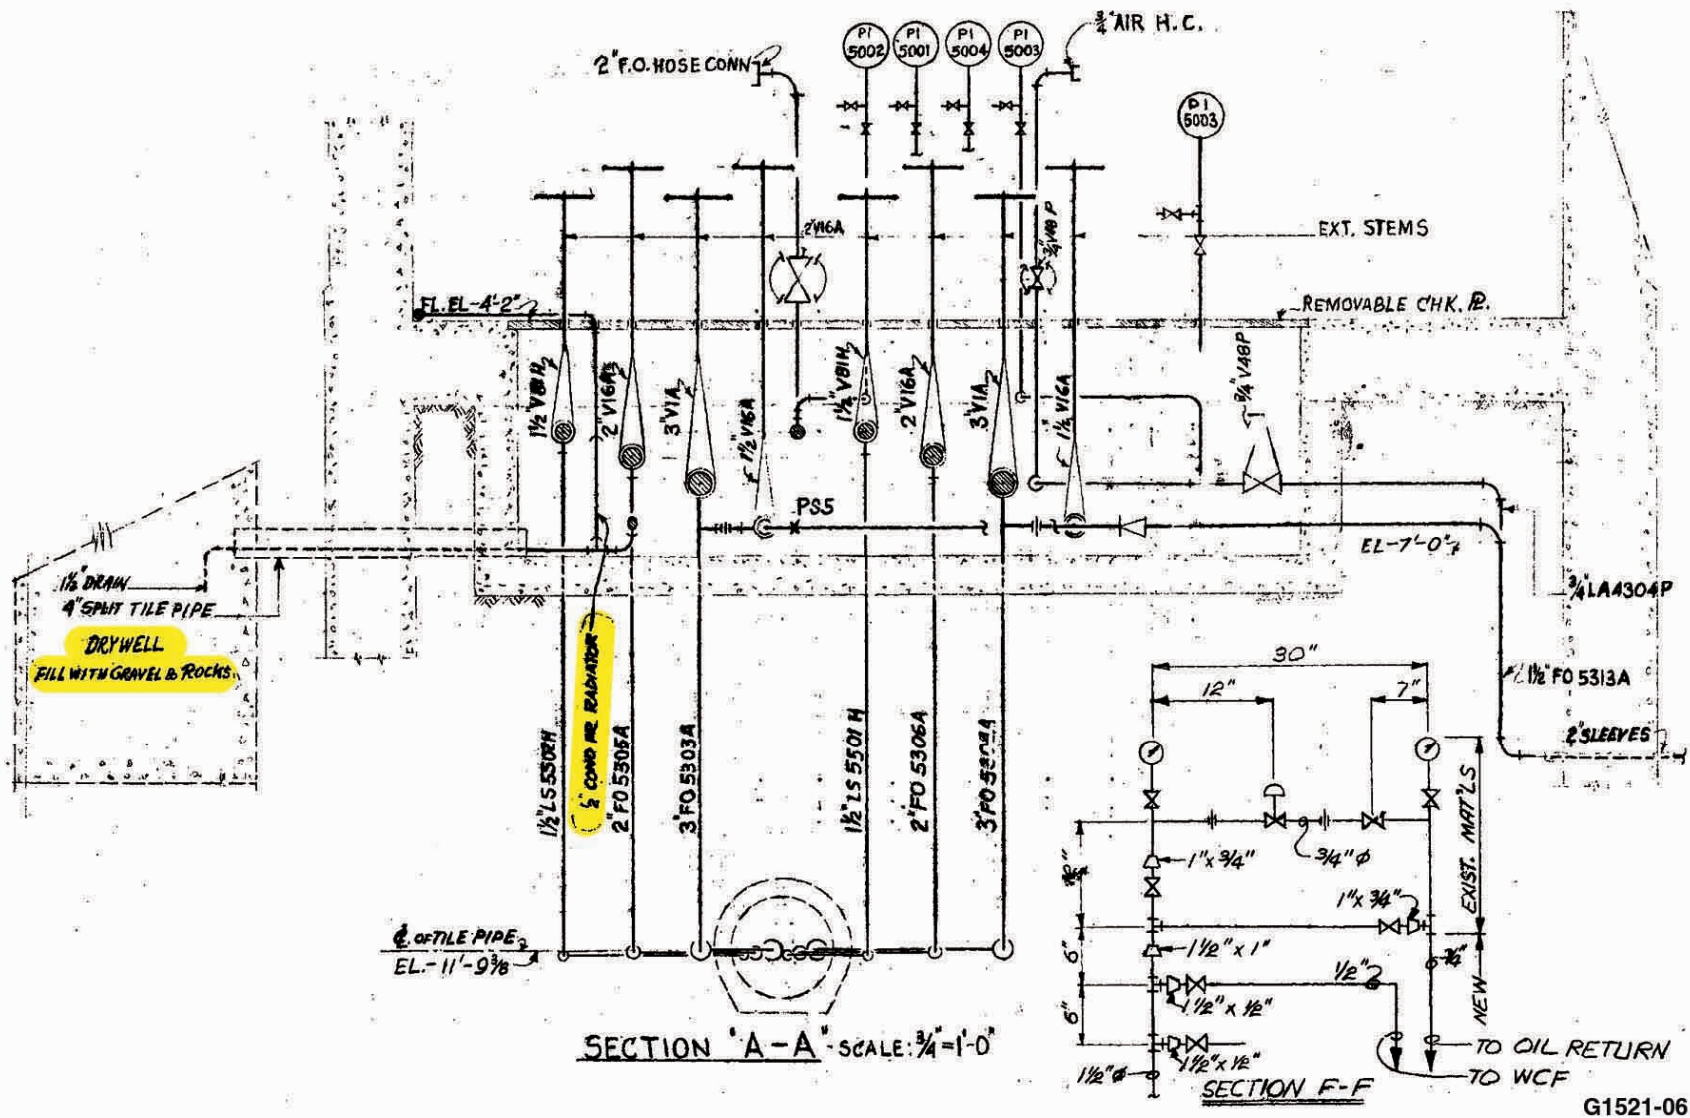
Piping section for building CPP-702 (from Drawing 103244).
